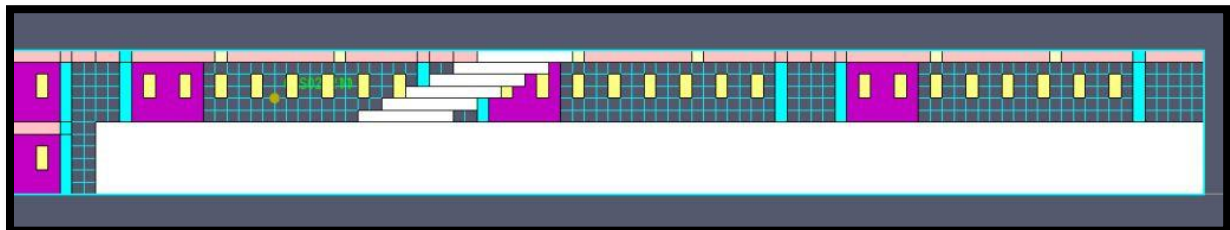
Close up front view of 36 m deck front section showing ramps (white) and walkways.
